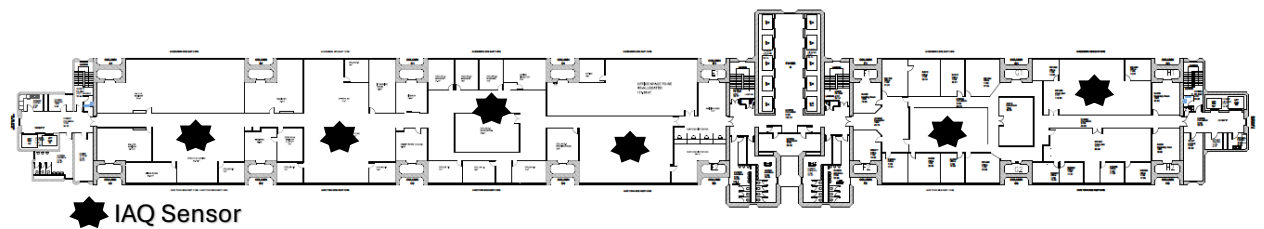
Tower Building proposed sensor positioning 13th floor (6)
